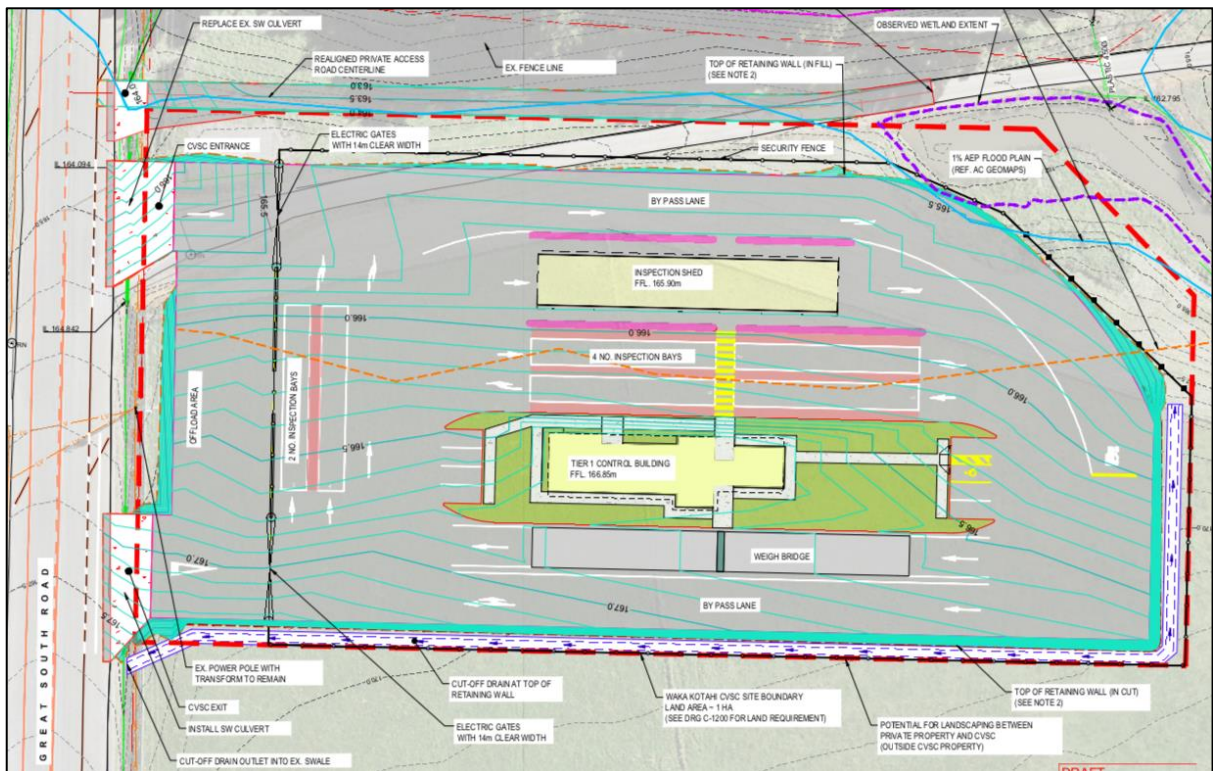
Site Plan (Source: Traffic Impact Assessment)
